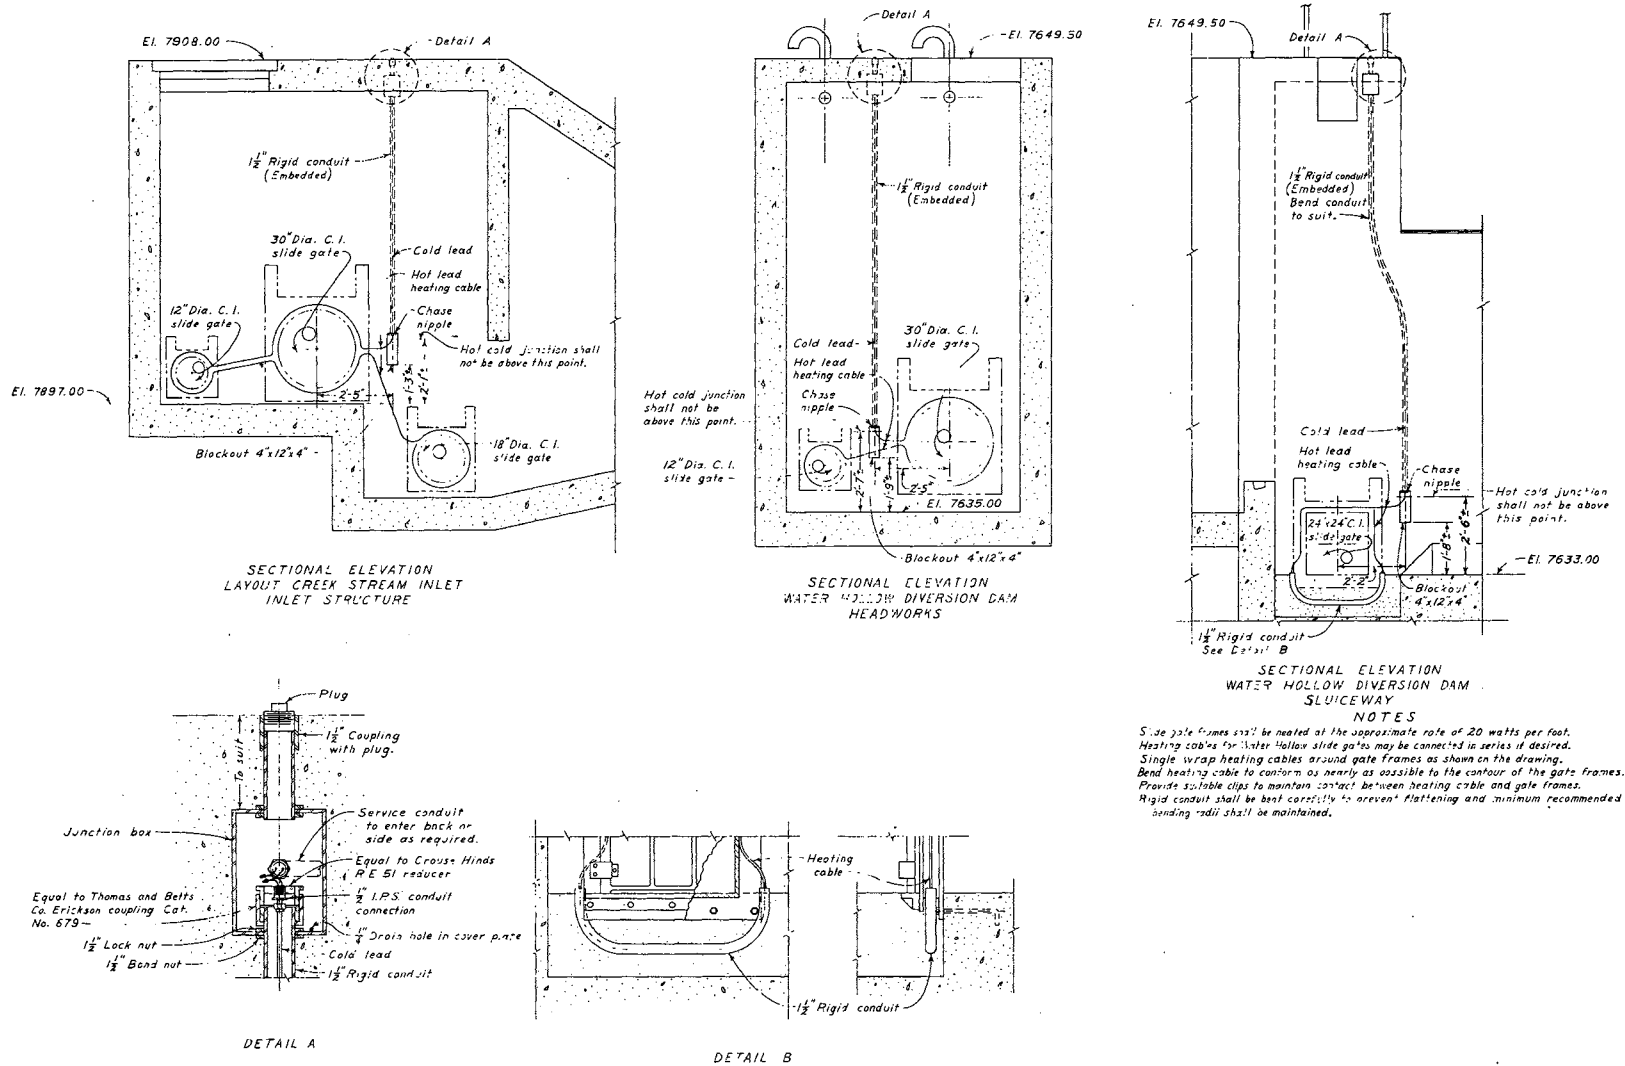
Slide gate heating installation for Layout Creek and Water Hollow—Strawberry Aqueduct. From Drawing No. 66-D-520
